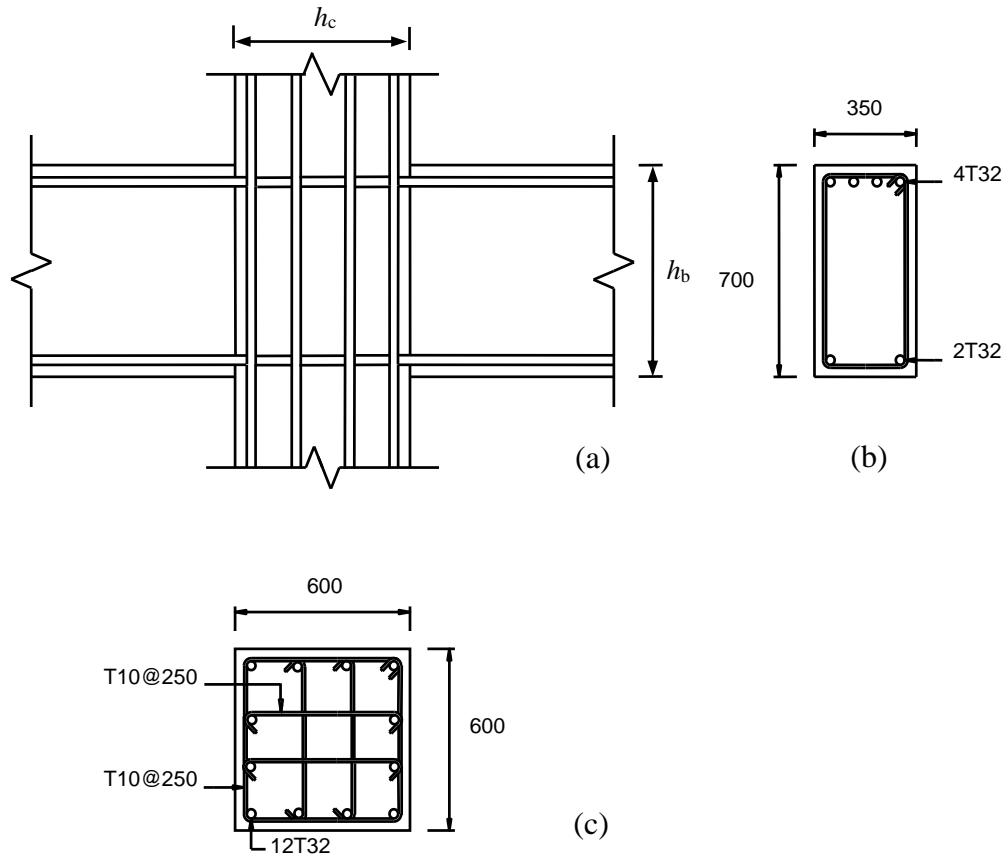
Interior beam-column joint. (a) Beam-column connection; (b) beam cross-section; (c) column cross-section of non-critical zones
